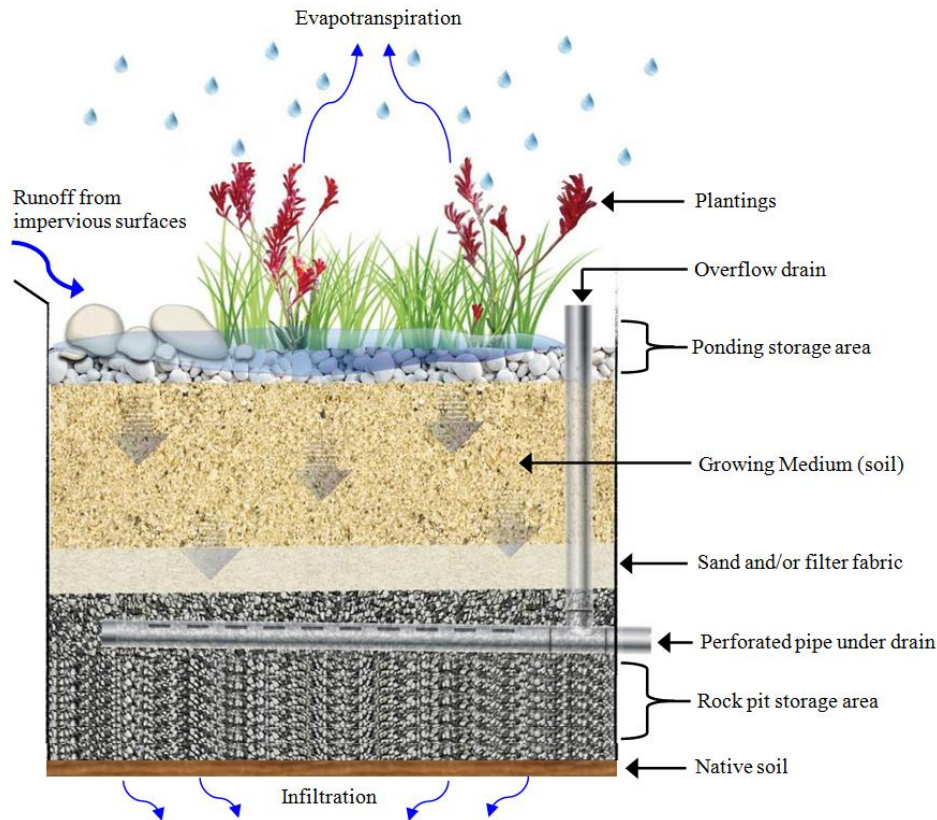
Rain Garden design with overflow drain, under drain and rock pit (adapted from Melbourne Water, 2010).
